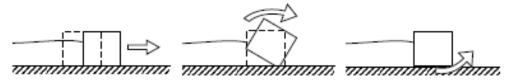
Failure mechanisms shearing, rotation and piping, (Boon, 2007)
